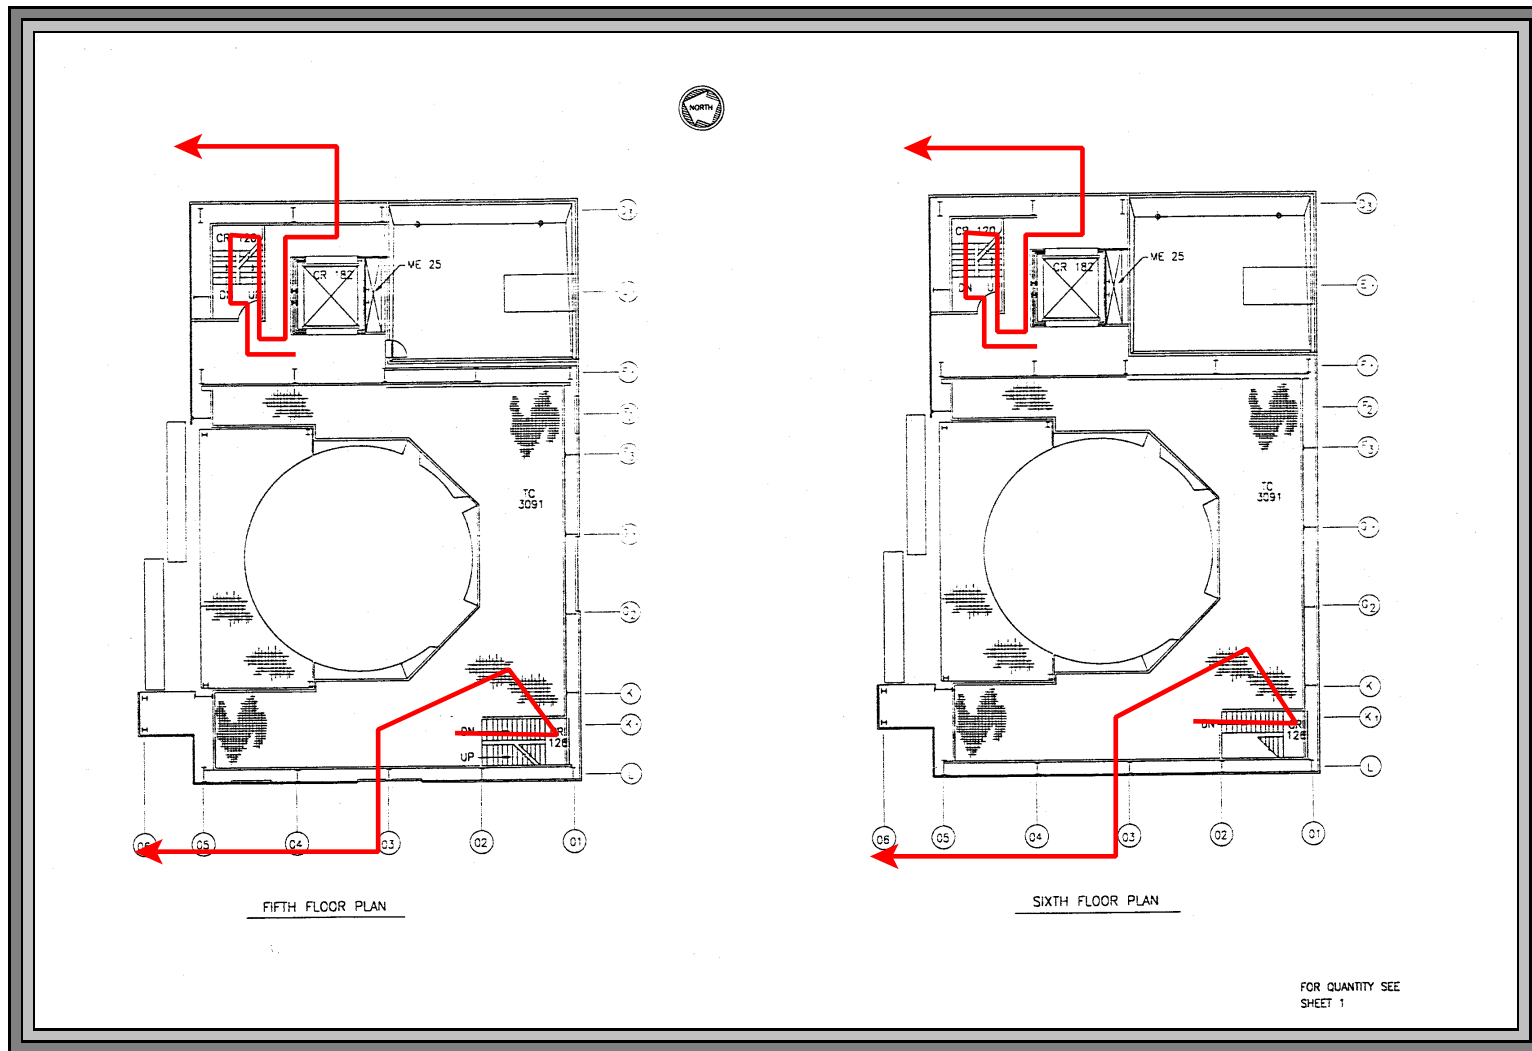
Figure E. Emergency evacuation routes via the east and west stairwells and ground floor exit doors from levels 5 and 6 of the NMFS-SSC facility located in building 3203.
